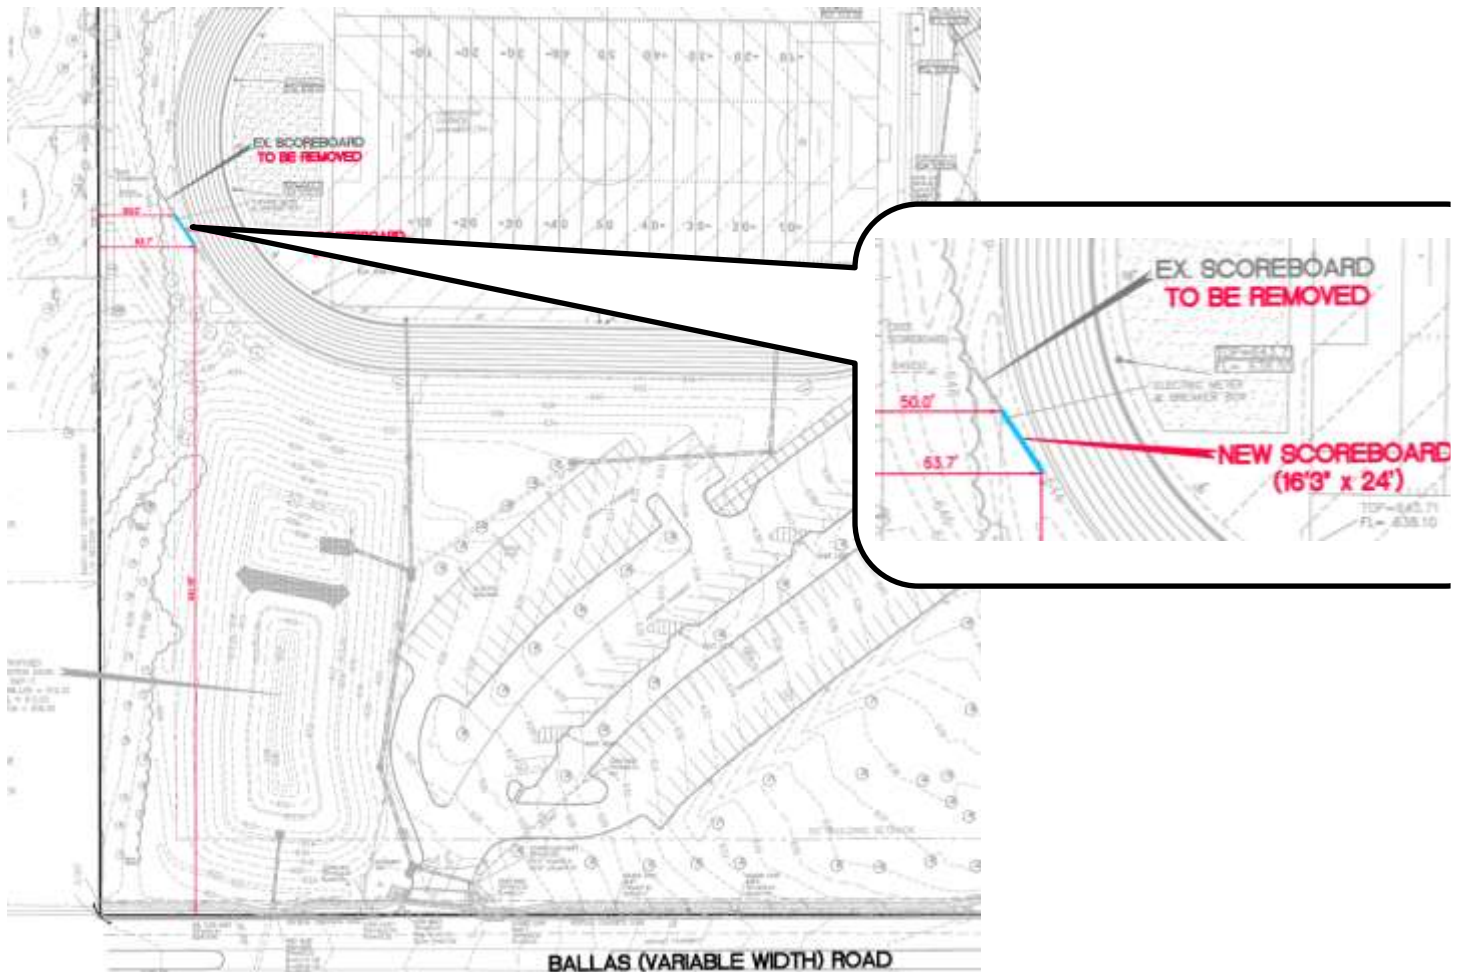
Close-up of the Site Plan emailed on October 16, 2019
